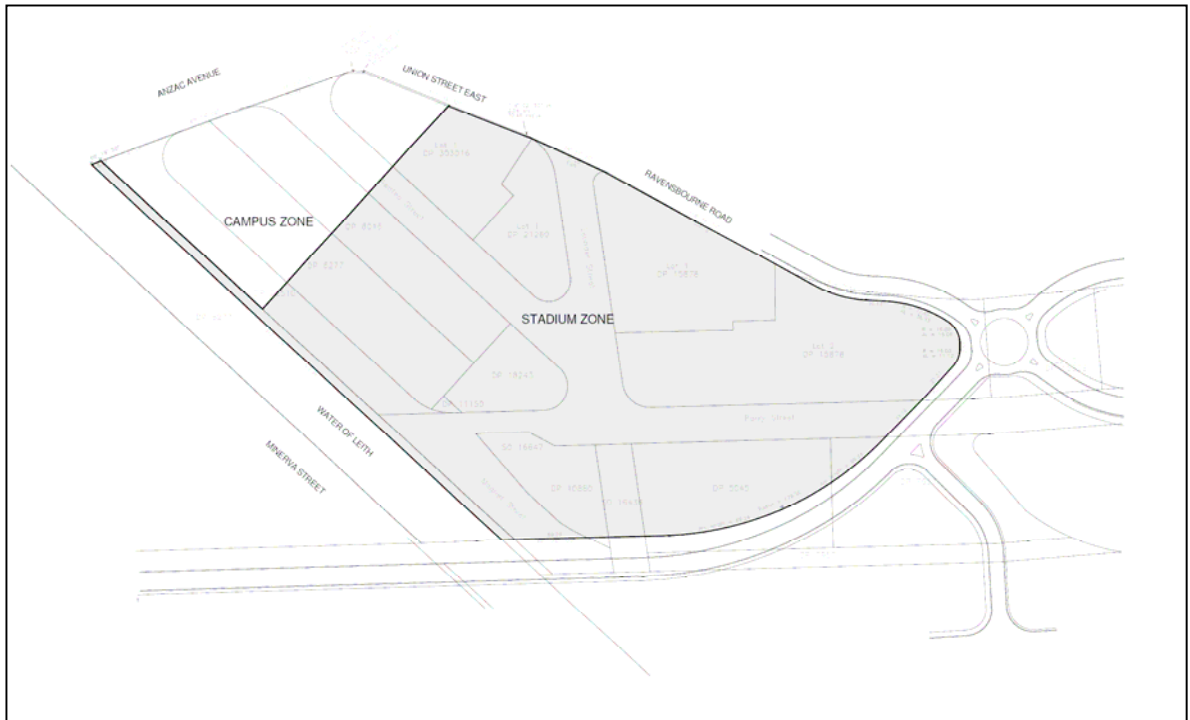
Proposed development area – new stadium zone and rezoned campus area
